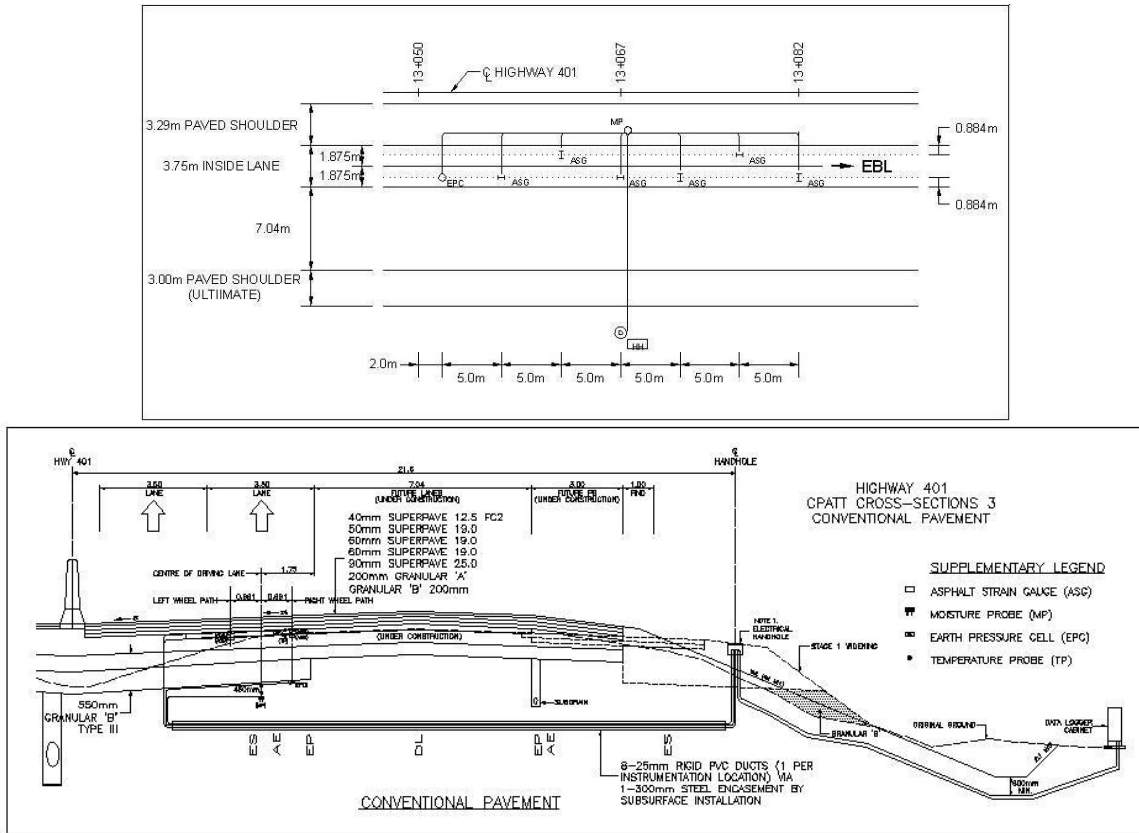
Plan and Cross-Section for the Conventional Pavement Section
